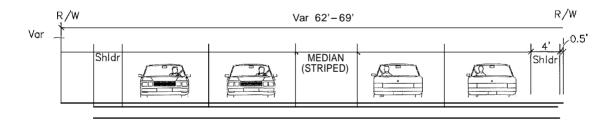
Segment 2 – Interim Roadway Section – Lower Sacramento Road to Legacy Estates (Looking East)
